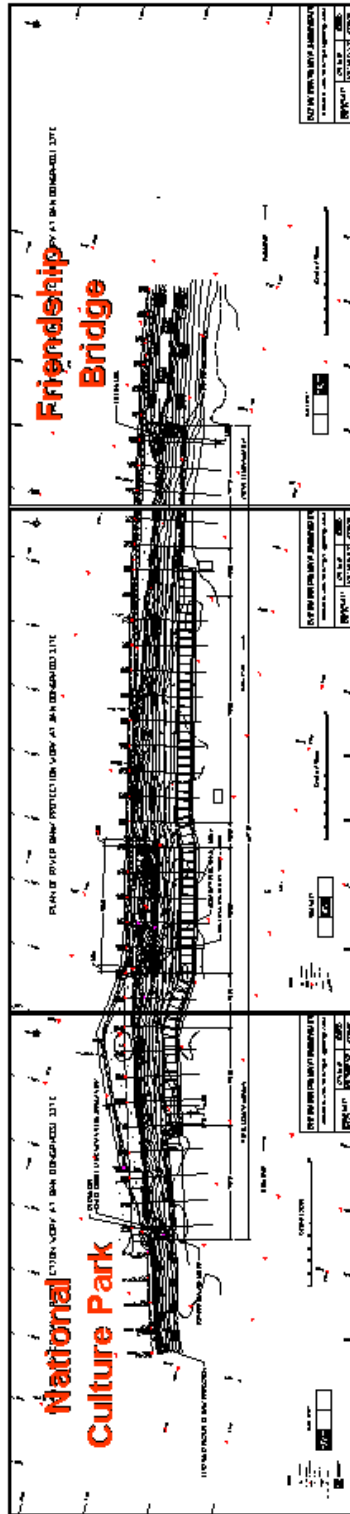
Completed Pilot Work at Ban Dongphosi Site
